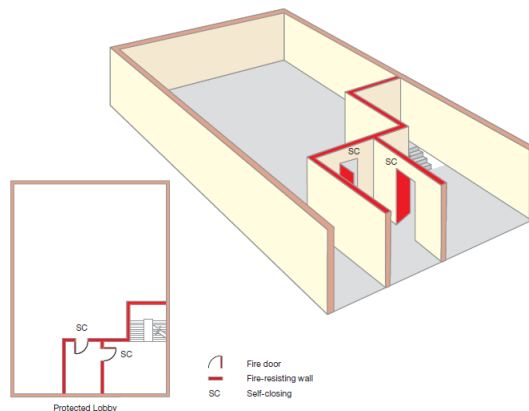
Examples of a stairway with protected lobby/corridor approach [5]
